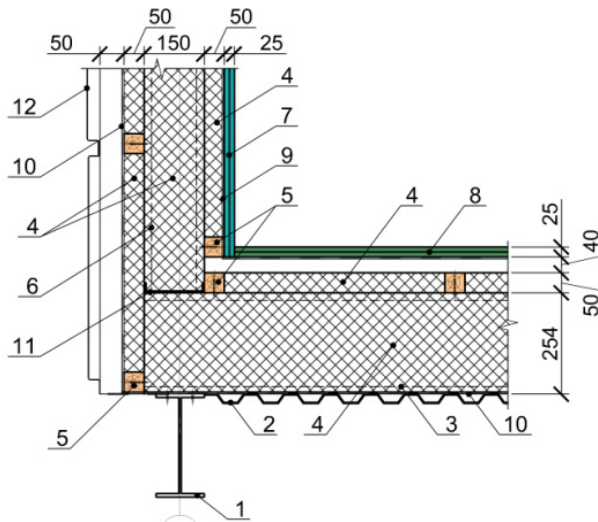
Typical solution of the conjugation of the outer wall with a basement ceiling; (1) foundation I-beam, (2) profiled decking, (3) thin-walled steel profile, (4) rock wool density 75 kg/m³, (5) block of wood, (6) rack mountable steel profile, (7) gypsum plasterboard, (8) glass-magnesium sheets, (9) vapor barrier membrane, (10) wind-water-proof membrane, (11) thin-walled steel guide profile and sealing tape Knauf- Dihntungsband, (12) front sheet.
